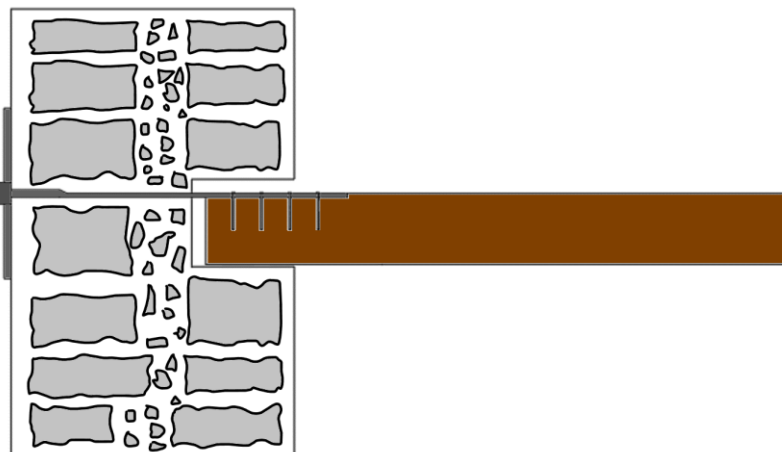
Reinforced timber floors using steel ties, rods, and nails in a key layout, to enhance the connection with the load-bearing walls.
